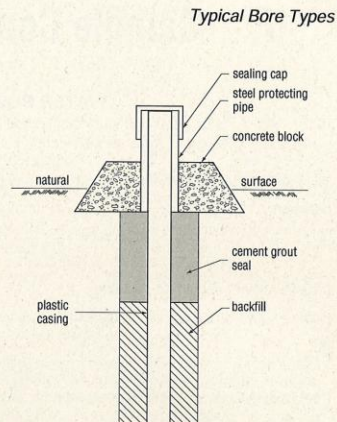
Permanent headworks for non-flowing bore with concrete pad and steel protecting pipe
